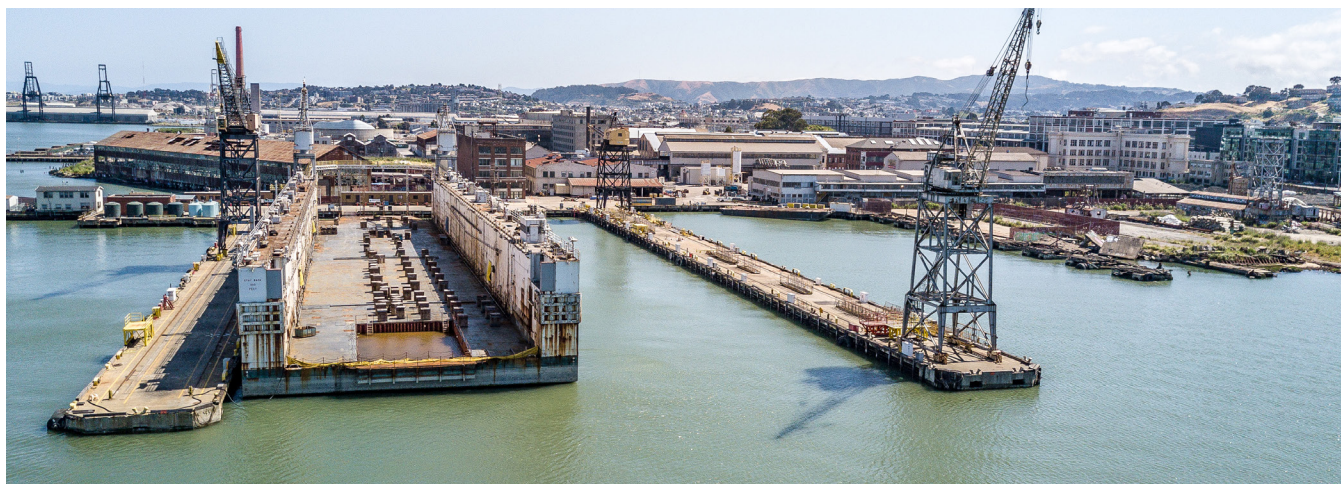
Existing structures on Pier 70. Jim Maurer (CC BY-NC-ND 2.0)
